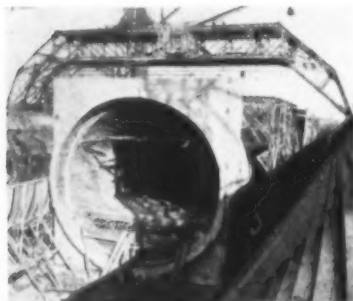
Constructing the 5,000-ton reinforced concrete units in dry dock
